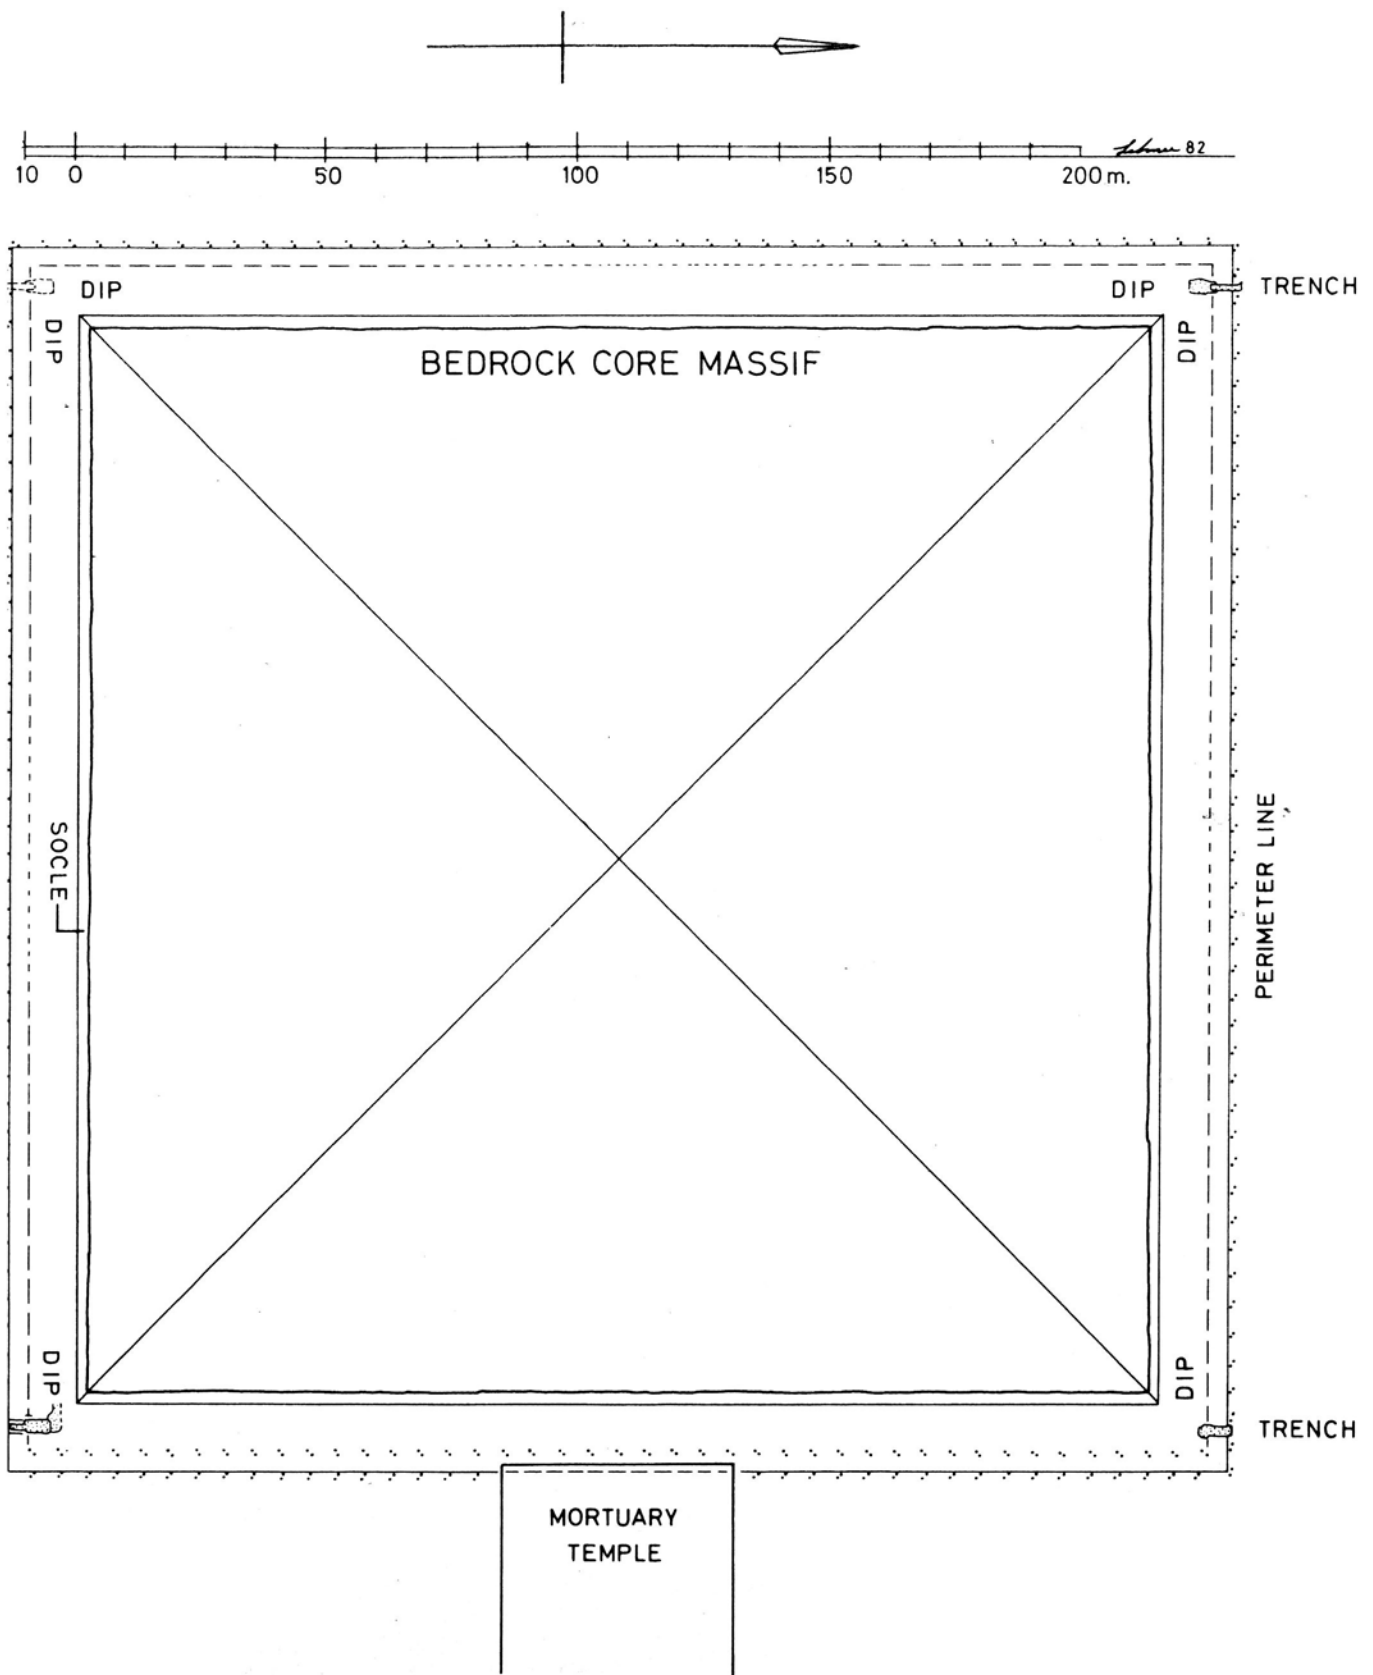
System of layout lines, holes and trenches at the Second Giza Pyramid. Schematic plan.
